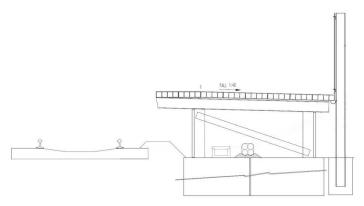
Cross-section of a typical Rail Modular Platform System.
